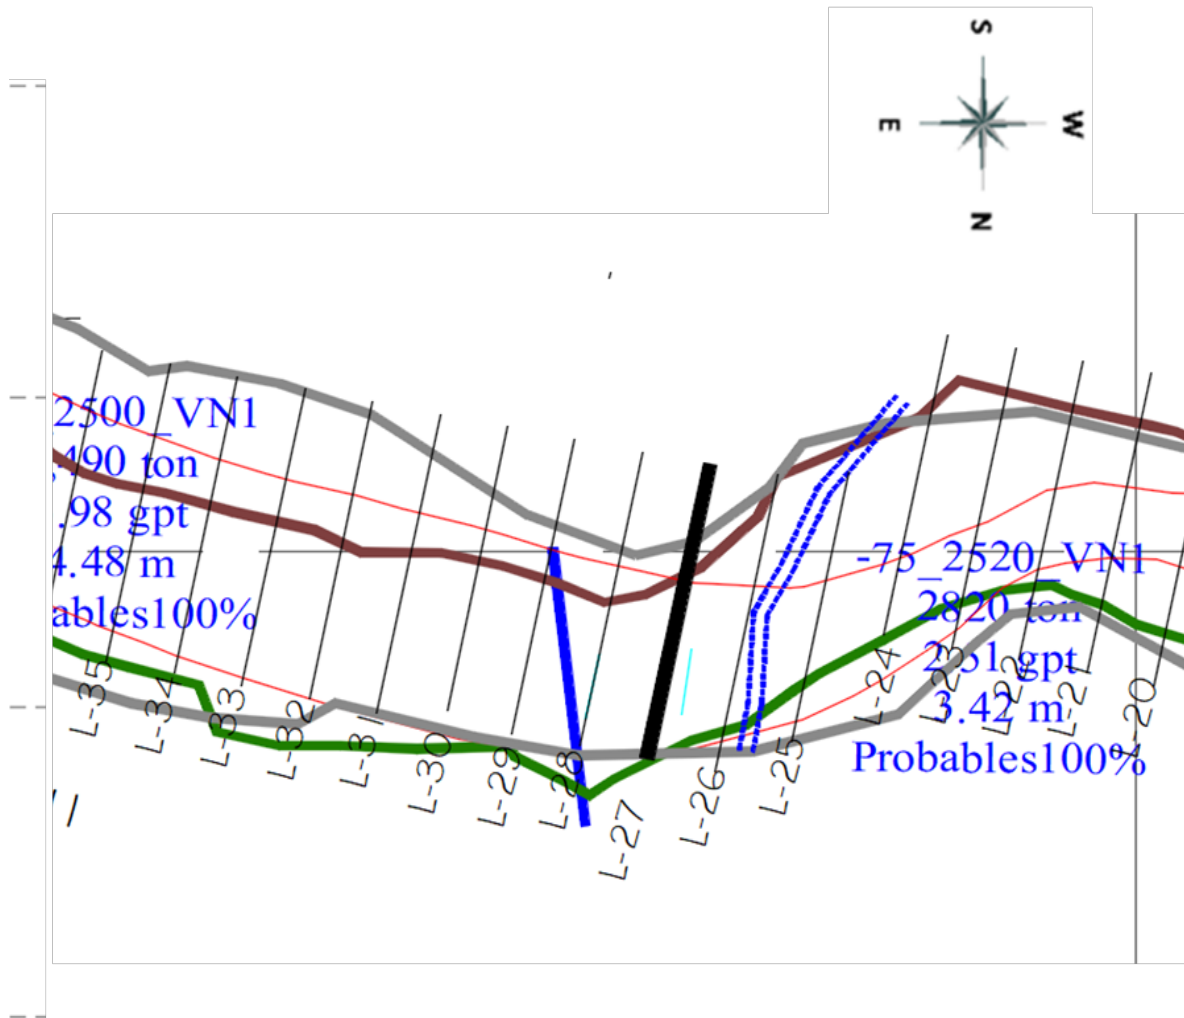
Typical Layout for Longhole Drilling Veta Nueva – Plan View
